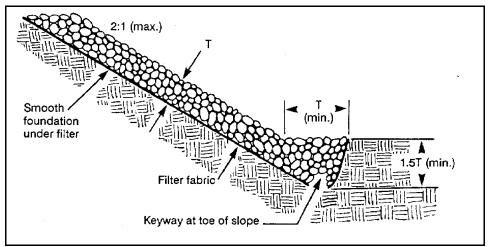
Construction of a riprap bank with toe protection (Source: Indiana Erosion Control Handbook)
